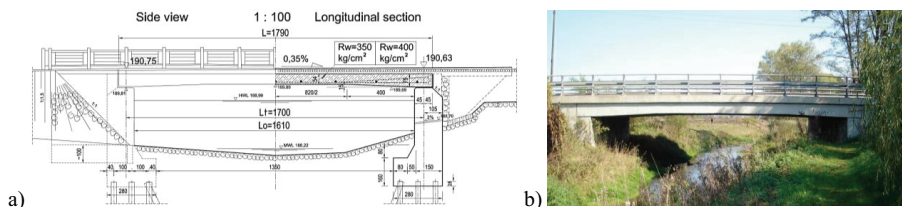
Bridge in Biłgoraj a) side view and the longitudinal section b) a photo from the outlet perspective.
